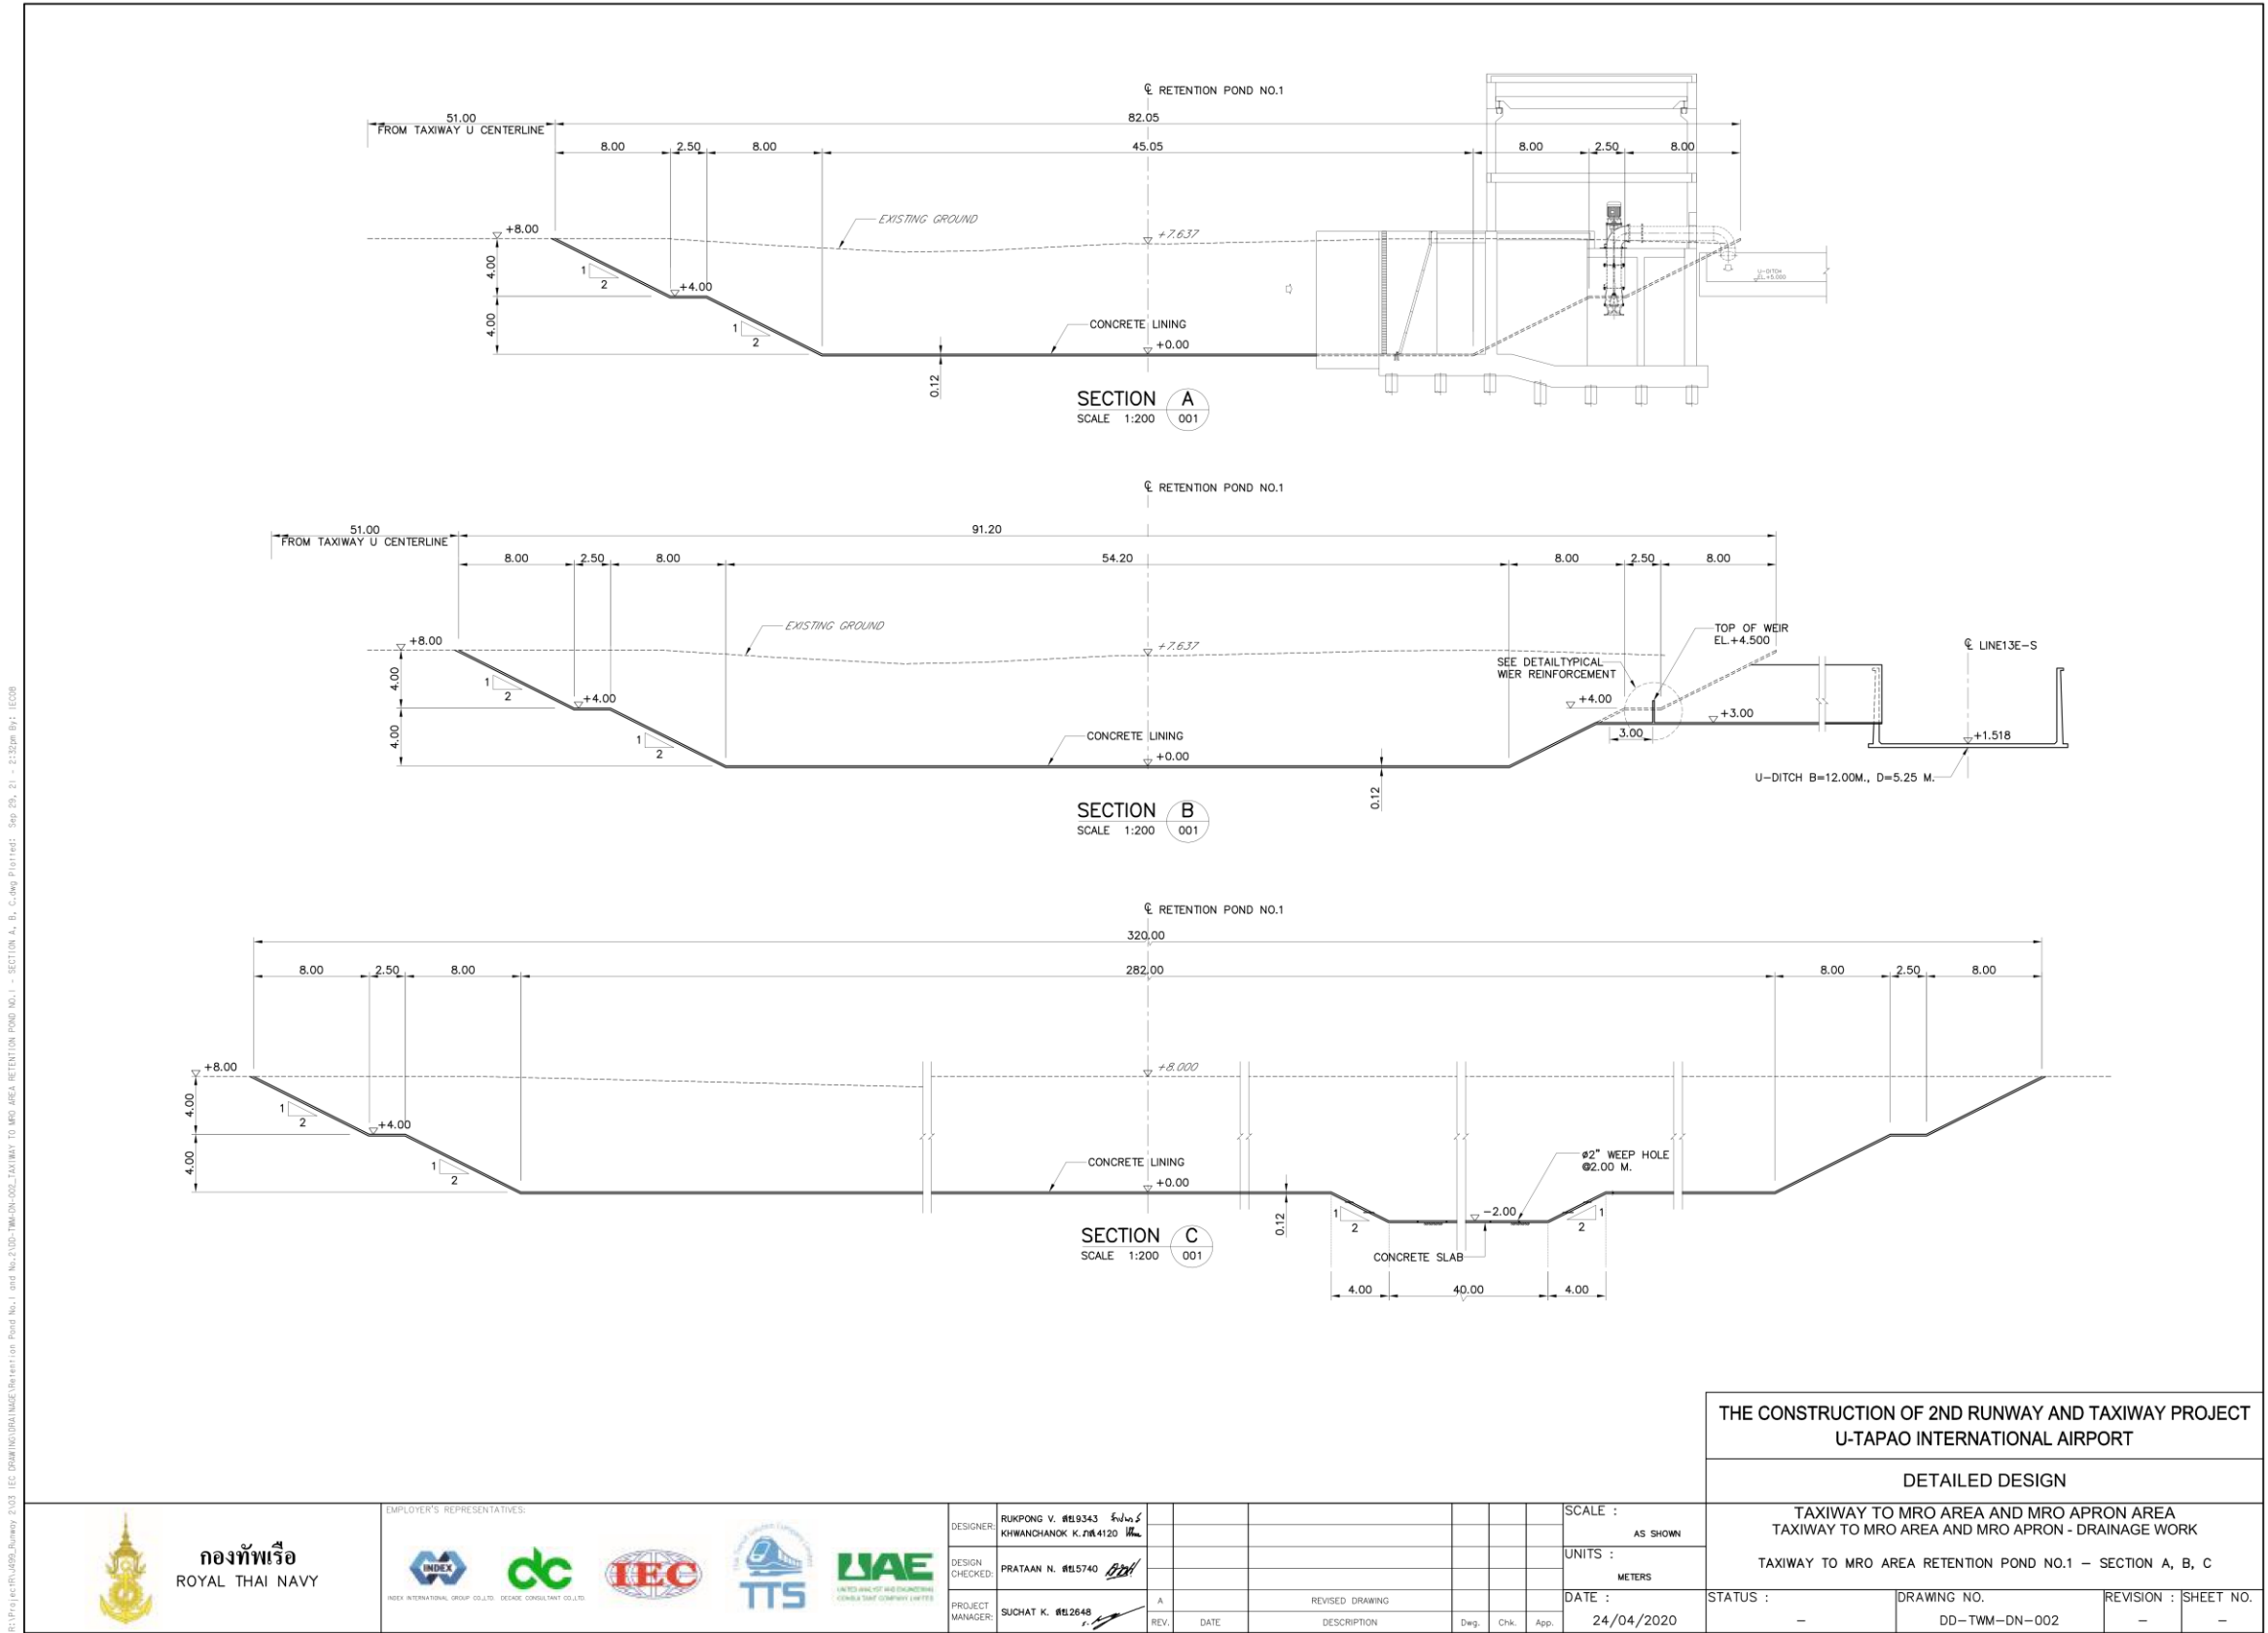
Image of a cut-out showing a water drain channel with a bridge in the location of the drain gate and a description of Retention Pond No. 1 appearing in the construction plan
